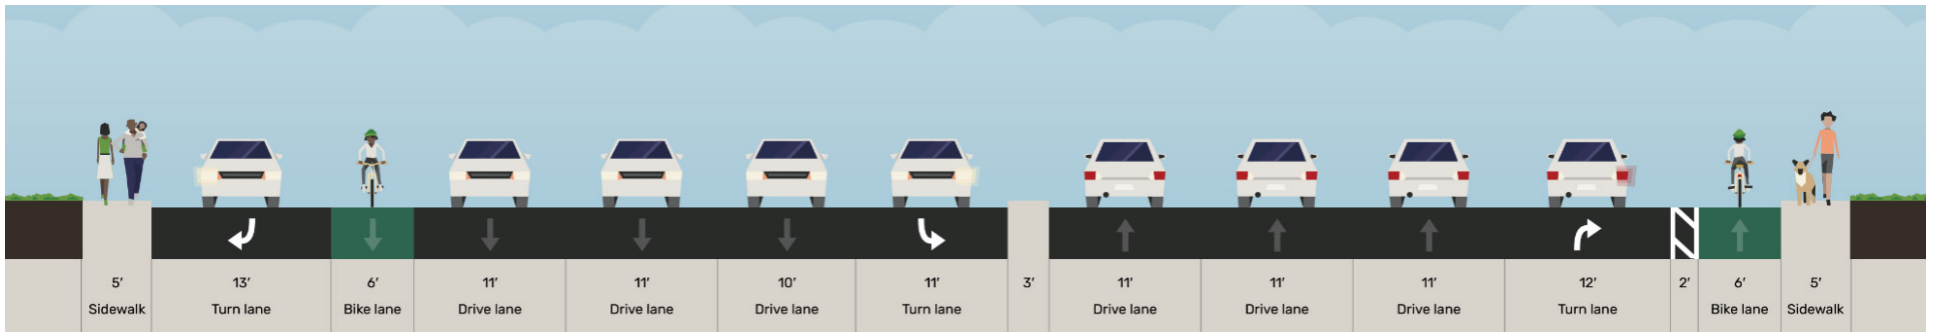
Proposed cross-section: Crenshaw Blvd from I-105 eastbound on-ramp to W 120th St
